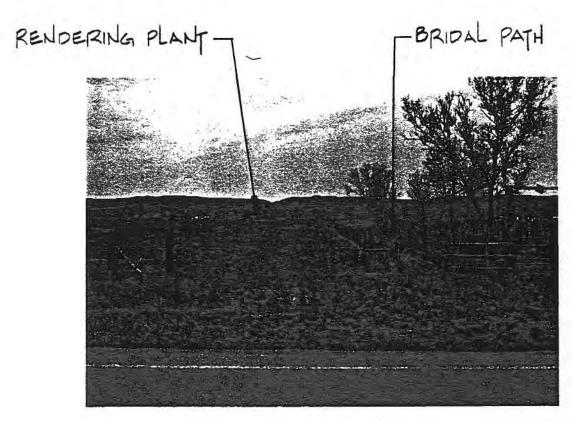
ROUTING YELLOWSTONE RIVER PIPELINE FROM RENDING PLANT ALONG BRIDAL PATH TO U.S. ROUTE 12 (VIEW SOUTHEAST & VIEW NORTHWEST)
